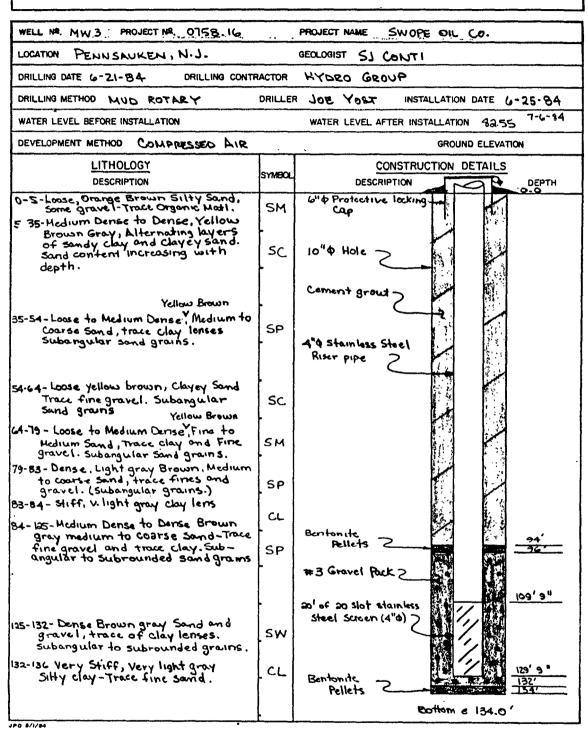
is an example of a completed well log sheet. This form accompanies the rock core and soil boring logs to provide detailed information on borehole stratigraphy and monitoring well installation.
